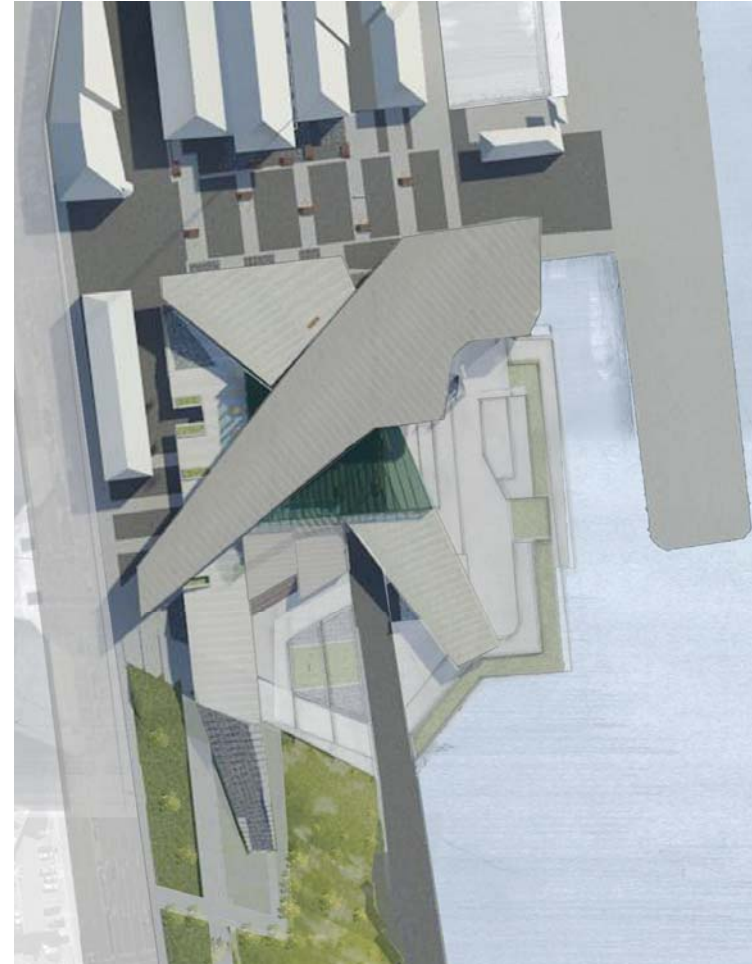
Site plan of the performance centre showing the connection to Frank Kitts Park, Queens Wharf and the waterfront. It also highlights the overlapping roof form. Scale 1:1200
